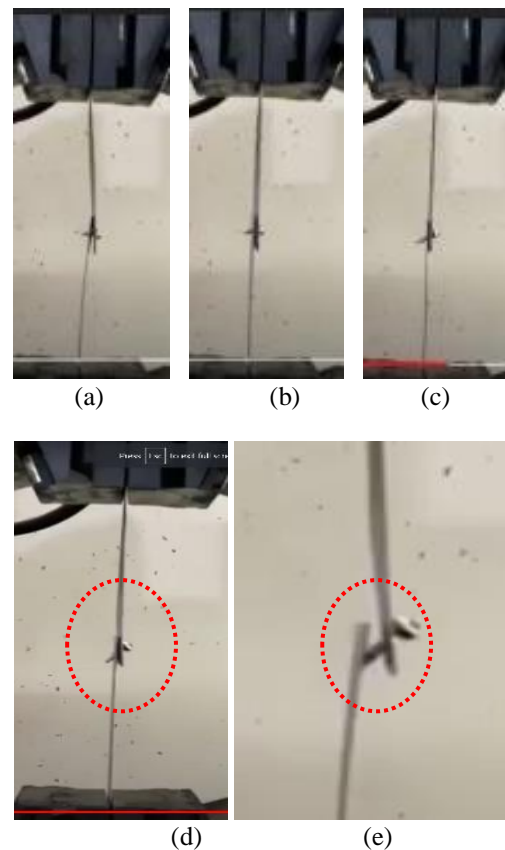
Tensile testing stage for CFS using screw connections, including (a) initial condition, (b) balanced level, (c) and (d) tilting failure, (e) pull out failure
